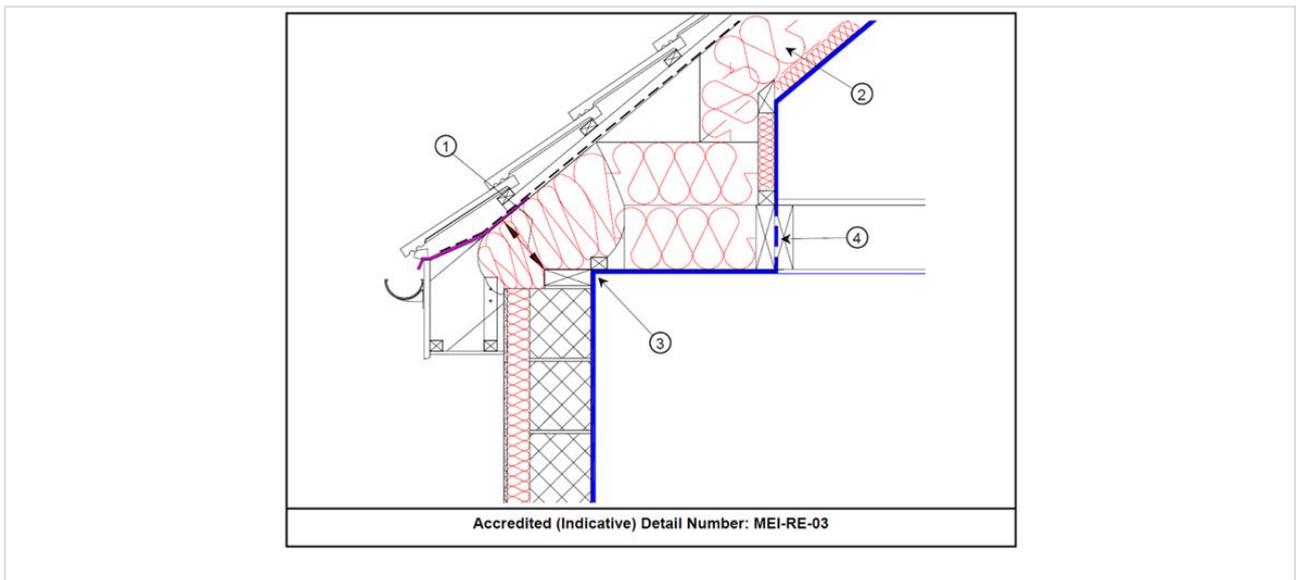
Illustration from ACD for Pitched Roof. Extracted from ACDs for Masonry External Wall Insulation.
